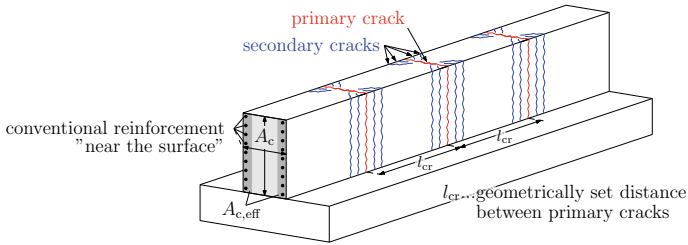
Schematic illustration of geometrically set primary cracks in a bottom-restrained wall and secondary cracks due to reinforcement in the vicinity of the primary cracks
